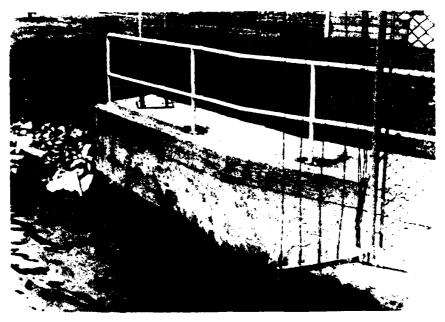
Taken from left spillway, looking at upstream portion of left abutment wall. Resurfaced and original concrete shows evidence of frost damage
